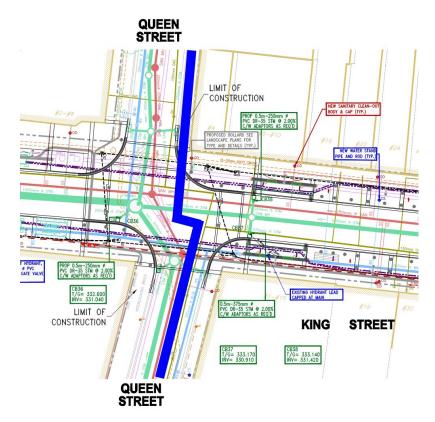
Proposed DE Trench (1.50 m wide) Queen & King
